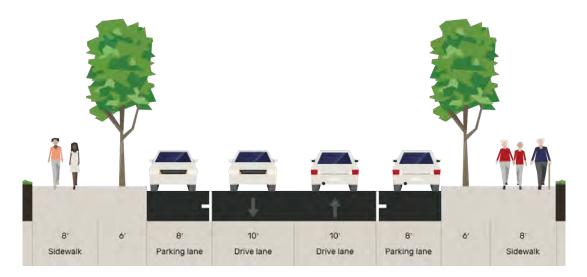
A: EXISTING LOCAL STREET CROSS-SECTION WITH CURB (SOURCE: STREETMIX)
